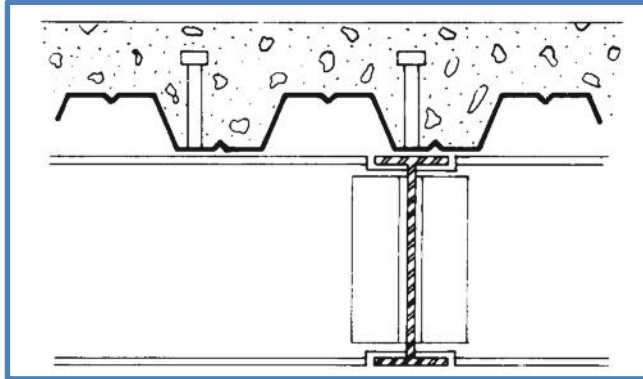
Example of cast-in-place concrete/steel deck solution. (Vulcraft)
